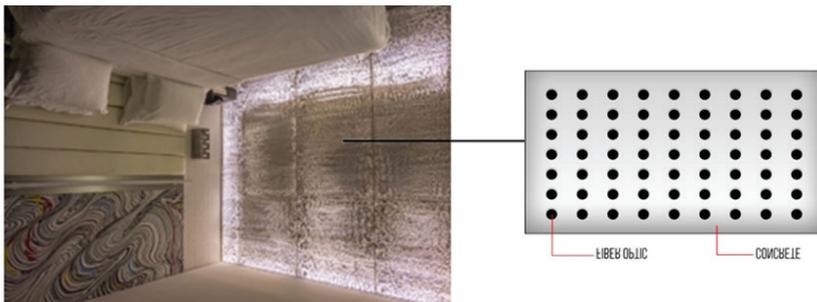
Example of Transparent Concrete Wall Applied in Bedroom
